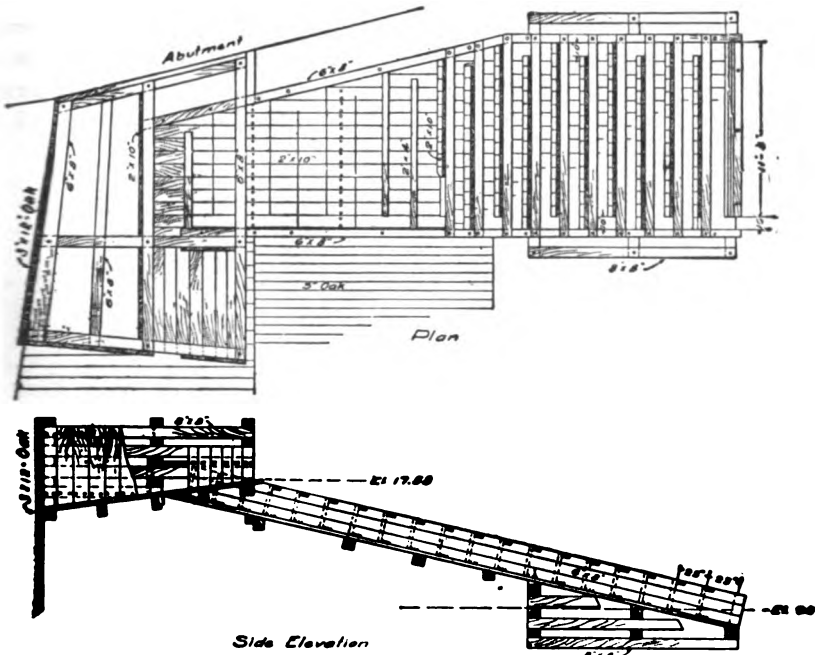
Timber Fishway in Dam at Sterling, Ill. (Eng. News.)
